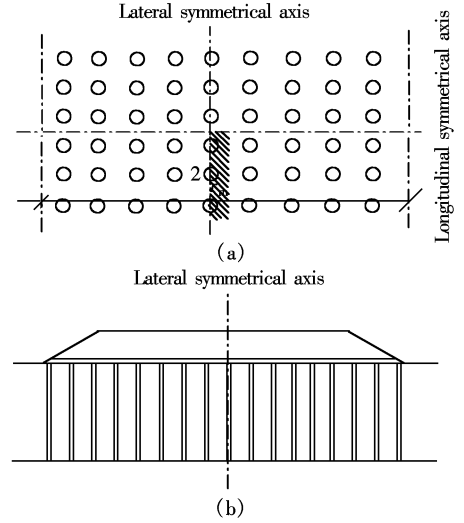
Symmetrical embankment. (a) Pile groups plan layout; (b) Pile groups section
